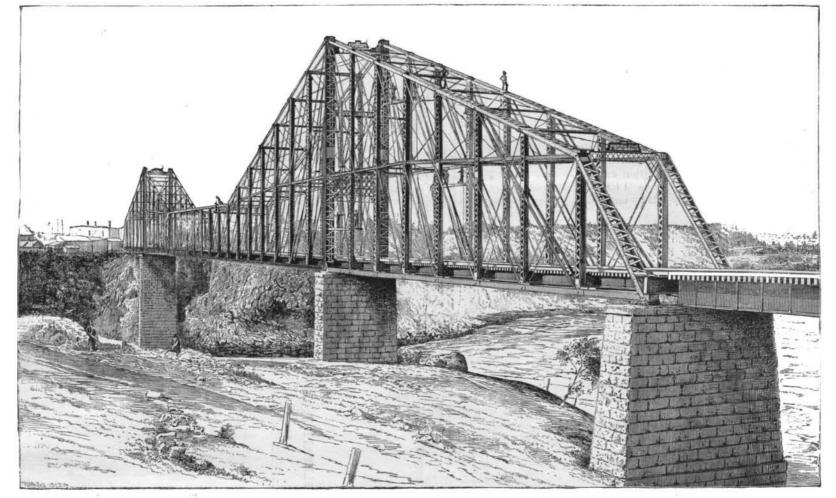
STEEL CANTILEVER BRIDGE OVER THE ST. JOHN RIVER, AT ST. JOHN, N. B.-VIEW FROM WEST END.
